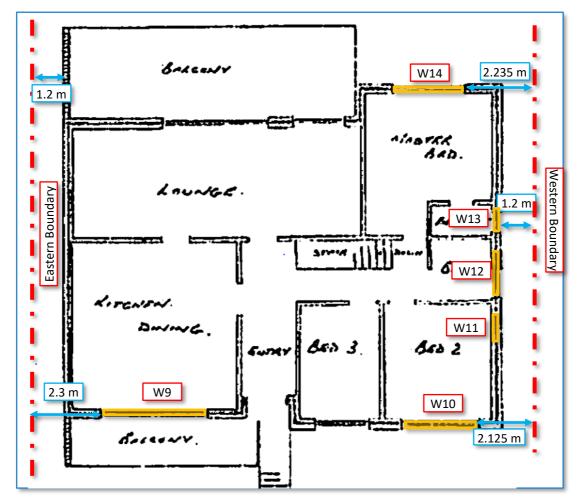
Level 1 floor plan showing unprotected openings and distance to eastern and western boundary
